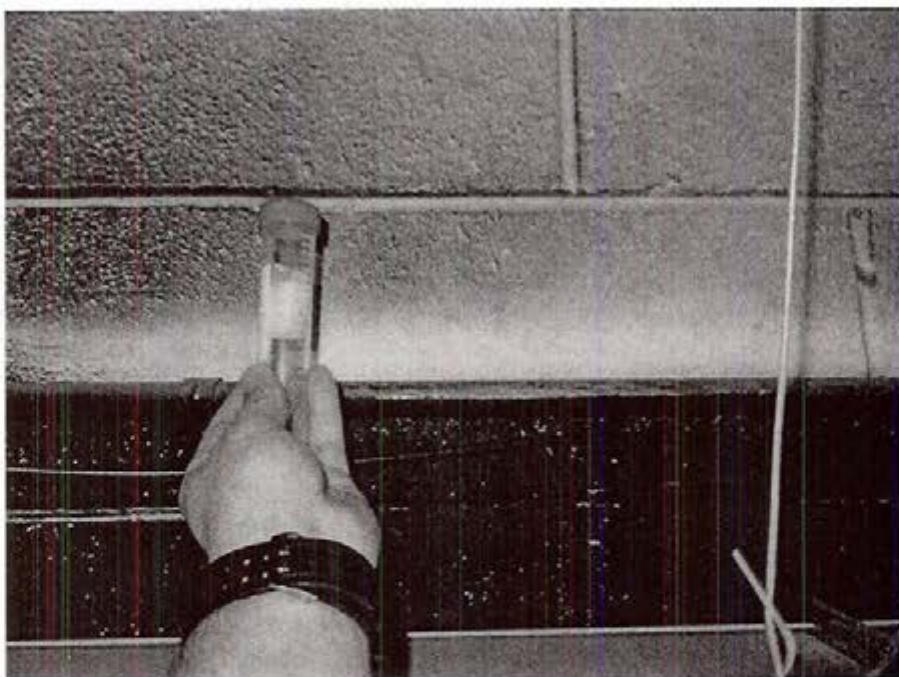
Lead wipe sample (042414-IFR-W-03) collected from the shell wall and attached conduit; above the drop ceiling of the east wall of the conference room.
